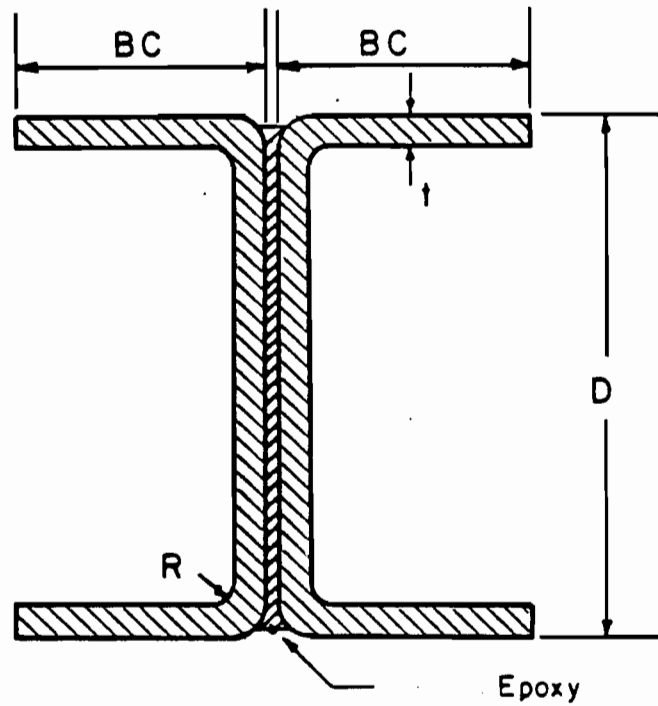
Cross Sections of I-Shaped Stub Columns
